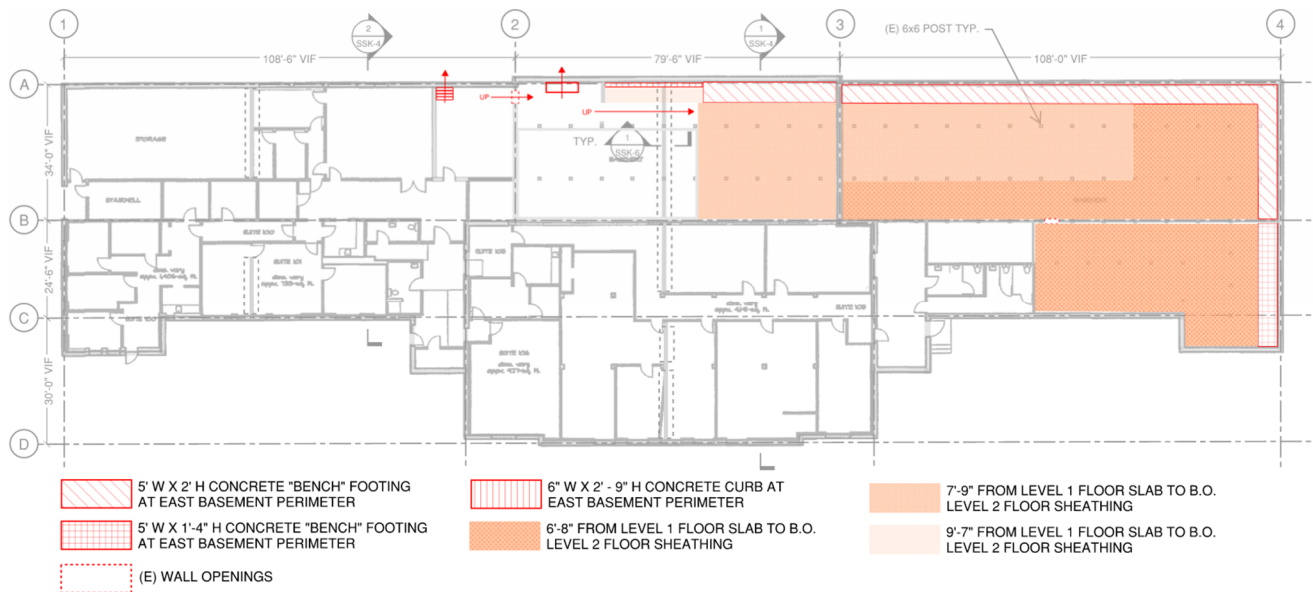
Stewart Building Level 1 Floor Plan: Floor Slab to Bottom of Structure Elevations at Non-Occupiable East Wing
